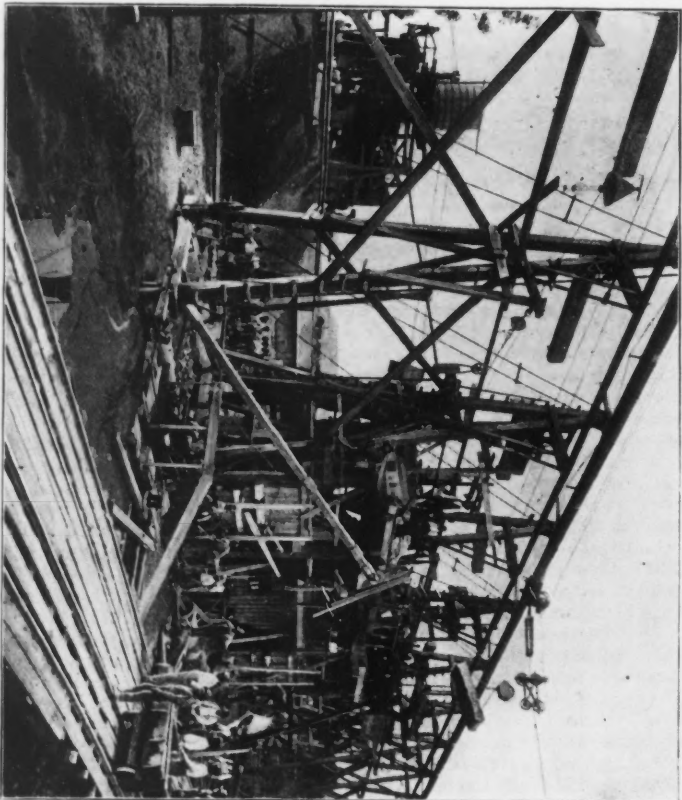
CONCRETE MIXERS, TRESTLE FOR DISTRIBUTING PLANT, AND CROSS-CARRIER TRACKS.
